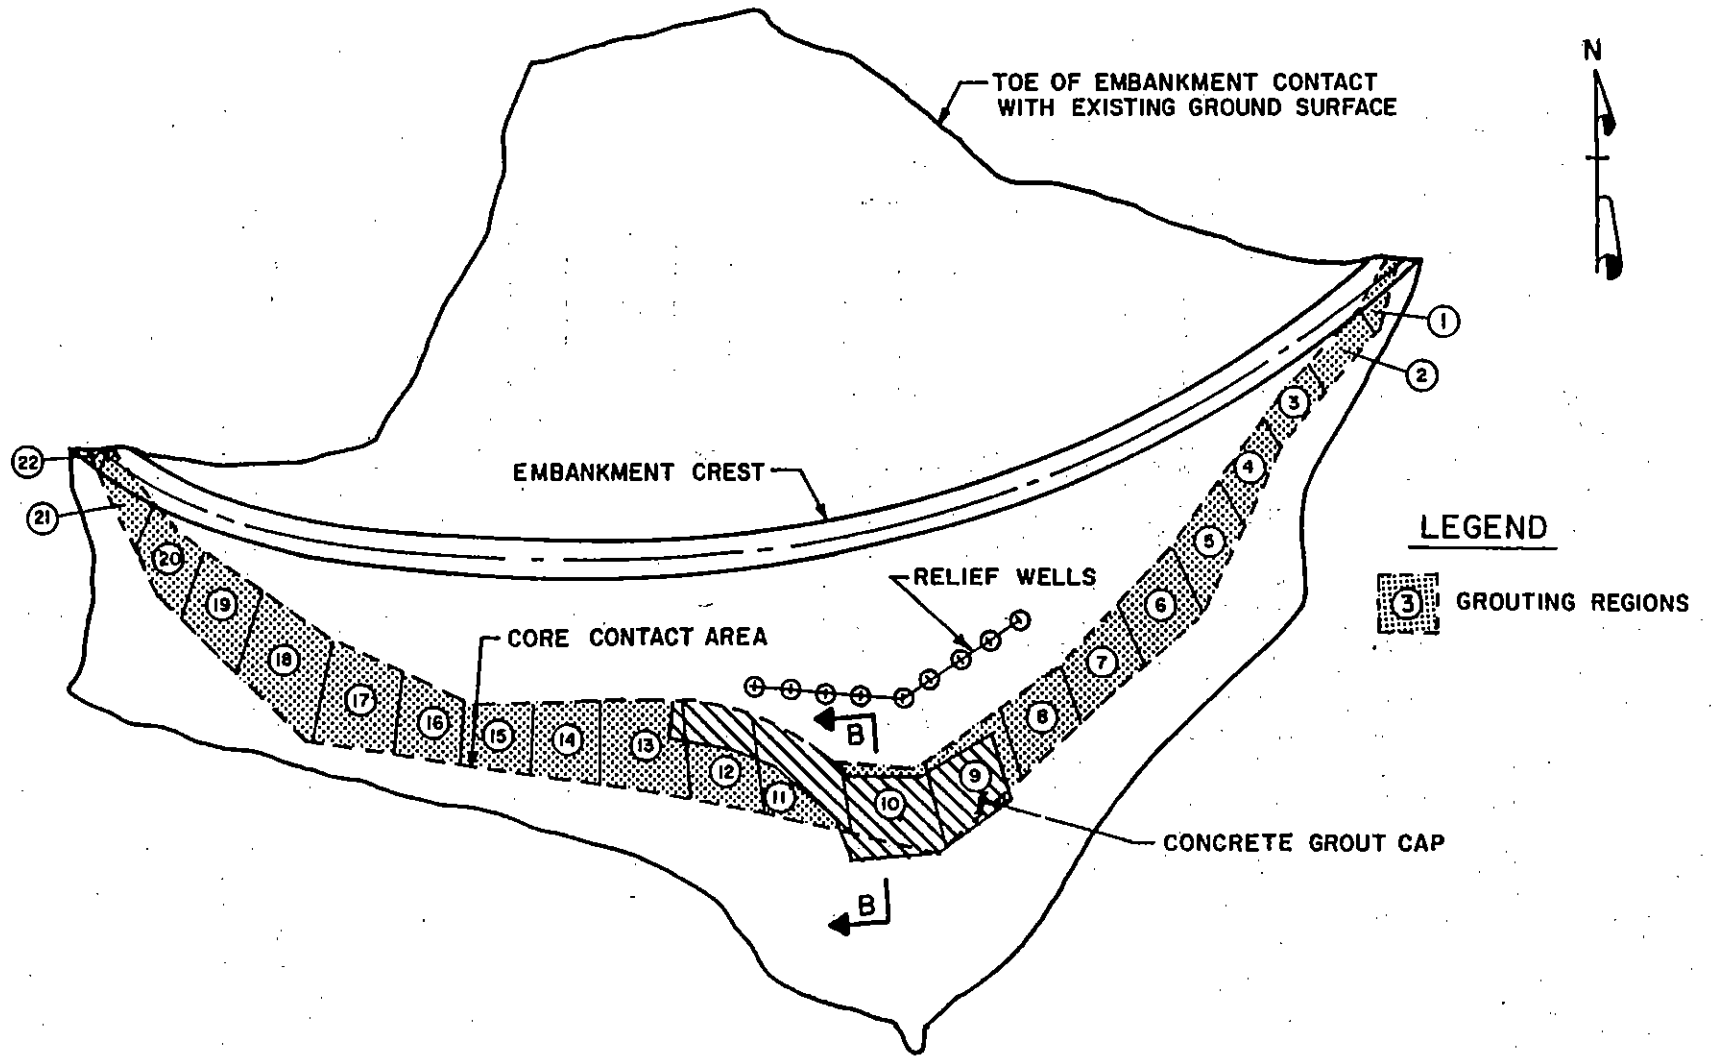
CORE CONTACT AREA, GROUT CAP, RELIEF WELLS AND GROUTING REGIONS
